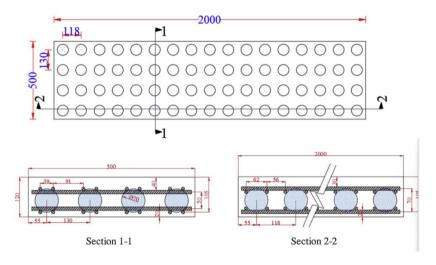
Details of One-Way slab Specimen(Al-Gasham et al., 2019)
